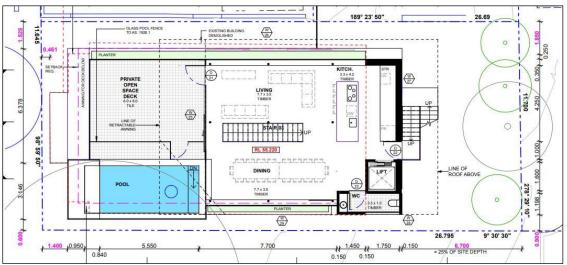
2<sup>nd</sup> floor plan (Burrow Architecture)
